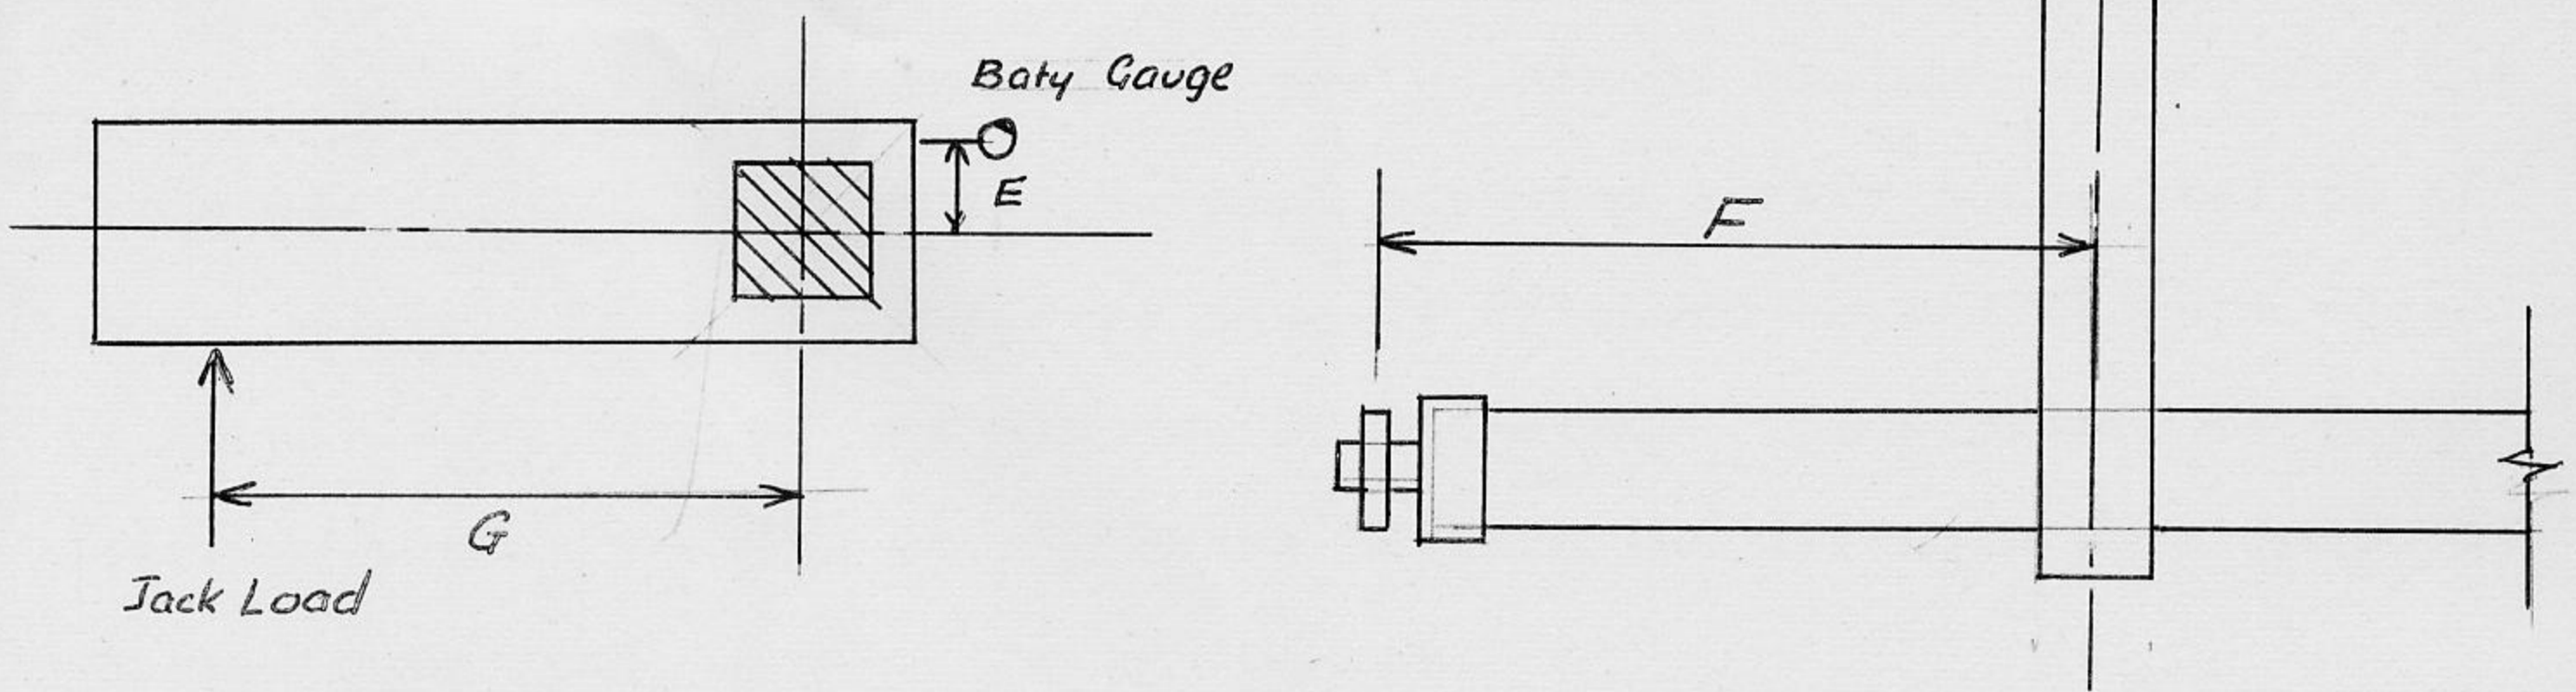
Elevation of Arm () and Plan of Arm and End of Beam
